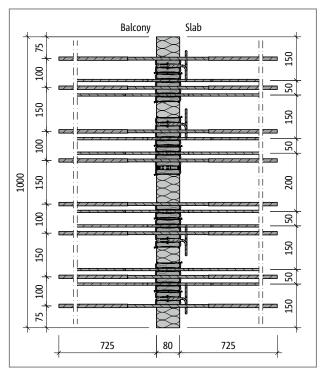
Schöck Isokorb® T type K-M6-VV1: Product layout
